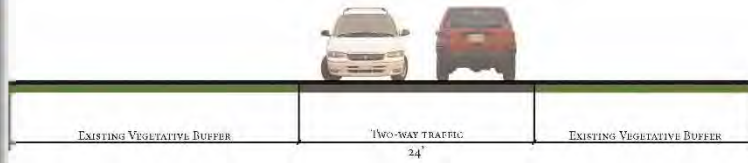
Davenport St. / Industrial Park Dr. Existing Road R.O.W. looking east
